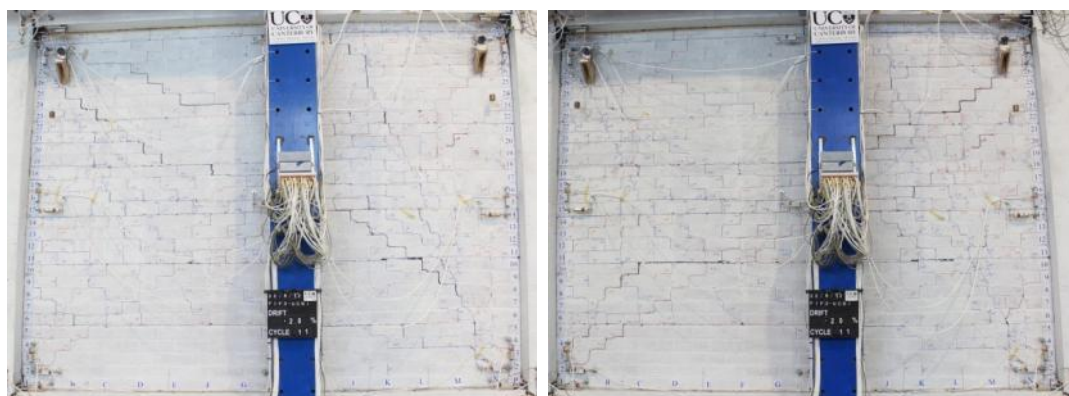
As built unreinforced clay brick infill wall specimen FIF3-UCBI: a) +1.25% drift (push), b) -1.25% drift (pull)
